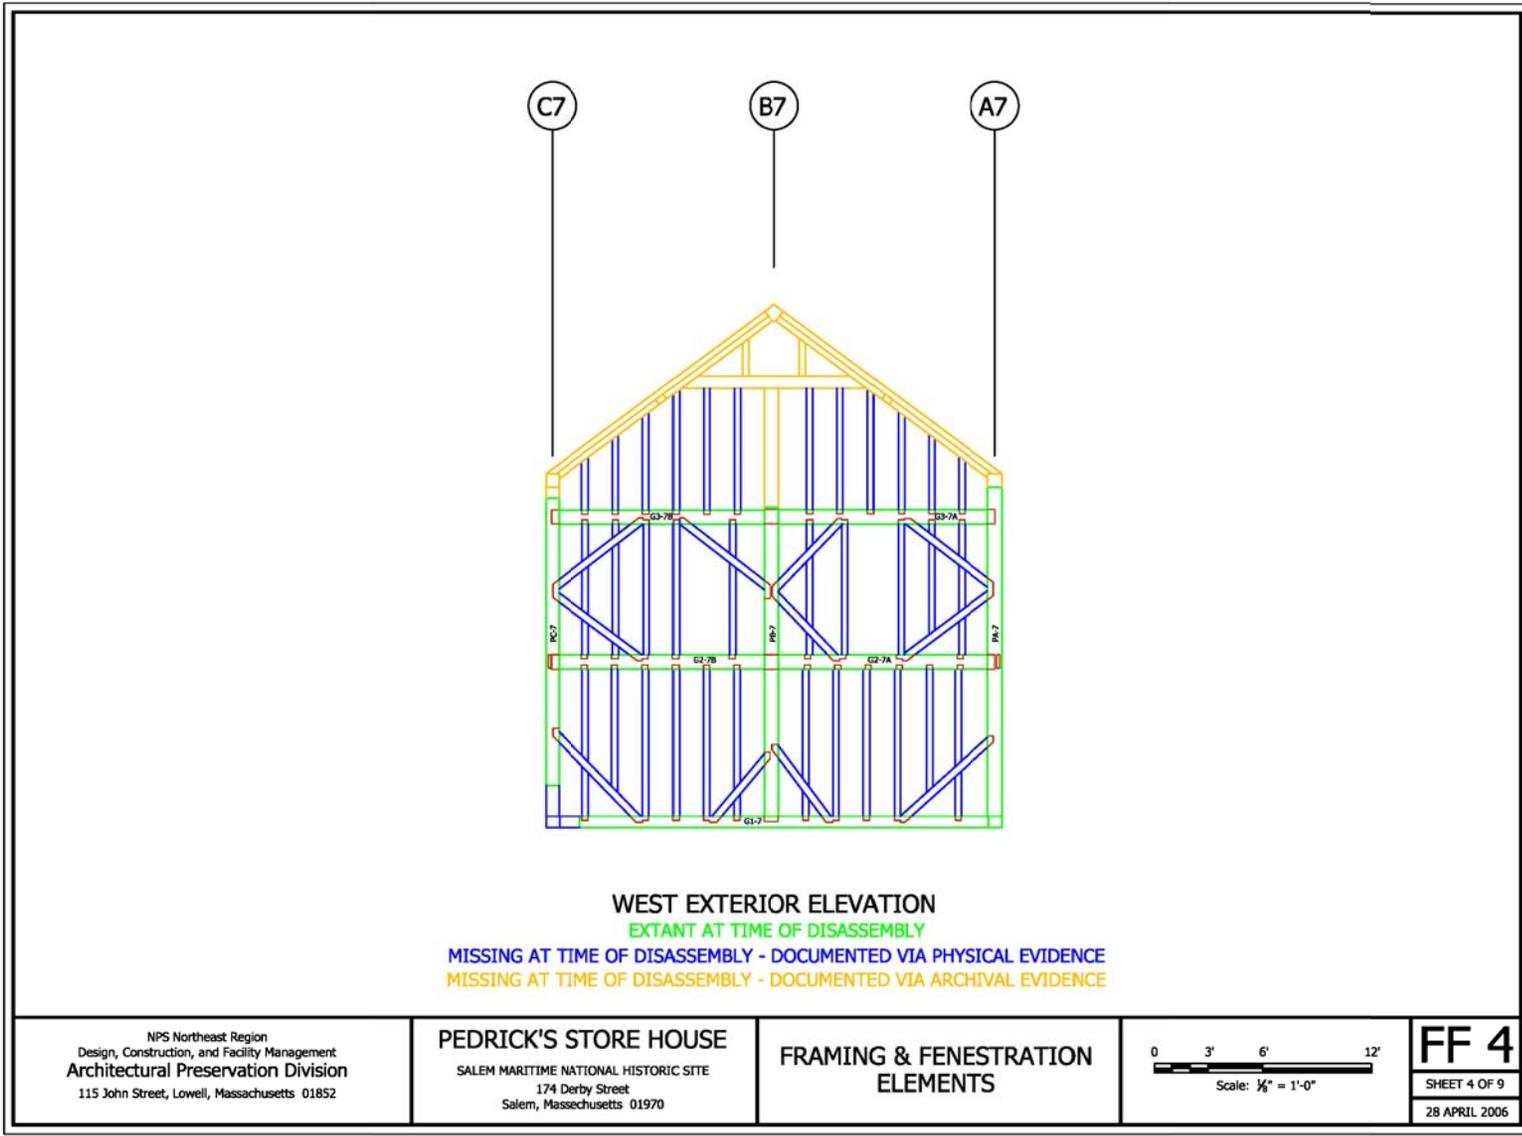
Measured drawing of framing and fenestration elements: West exterior elevation.
